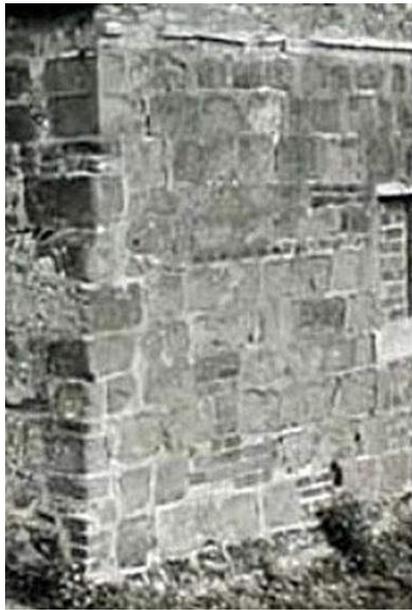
Detail from RCHM photo 2826/44 showing areas of brick repair in west wall - later replaced in stone.
